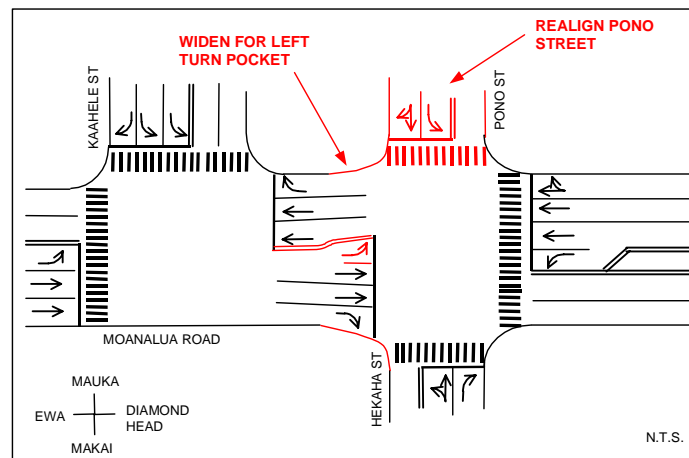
Moanalua Road at Kaahale Street, Hekaha Street and Pono Street
